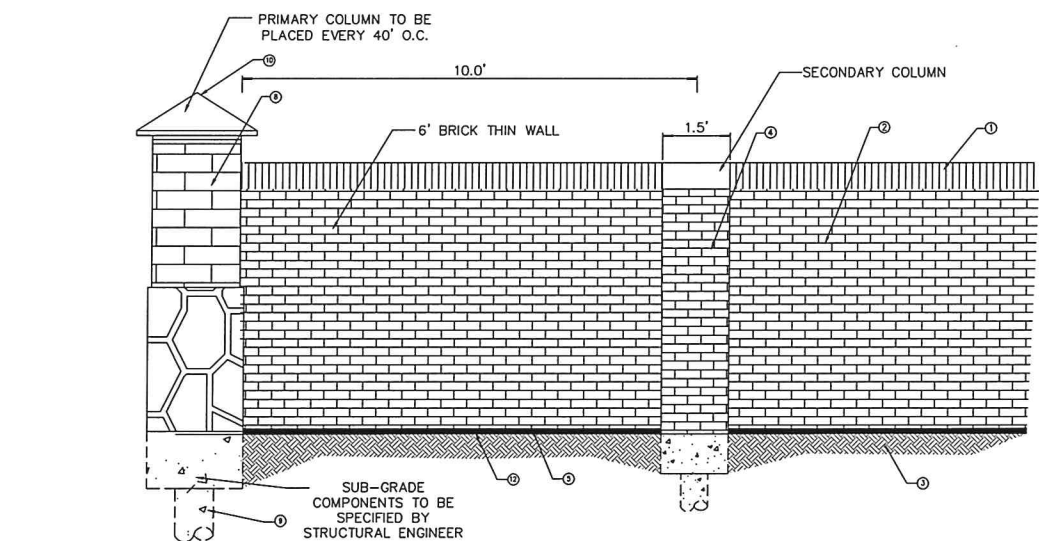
#### EXHIBIT B CASE NO. ZC#17-005 DEVELOPMENT PLAN MAIN STREET VILLAGE 16.130 ACRES 77 TOWNHOUSE LOTS OUT OF THE
